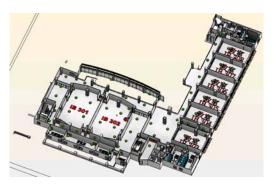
Bluetooth sensor embedded in the 3rd floor of IB building
